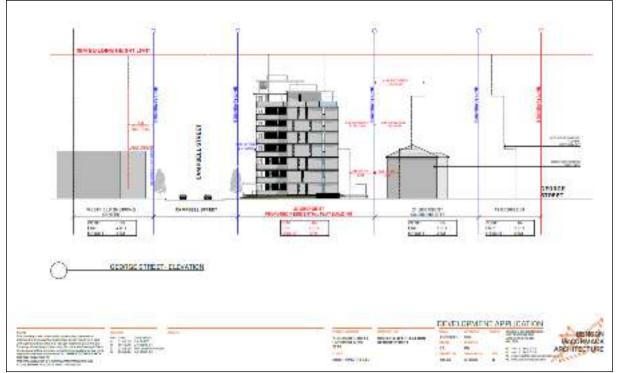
View of the George Street Elevation of the Proposal (source: A-0010-D prepared by Benson McCormack Architecture).
